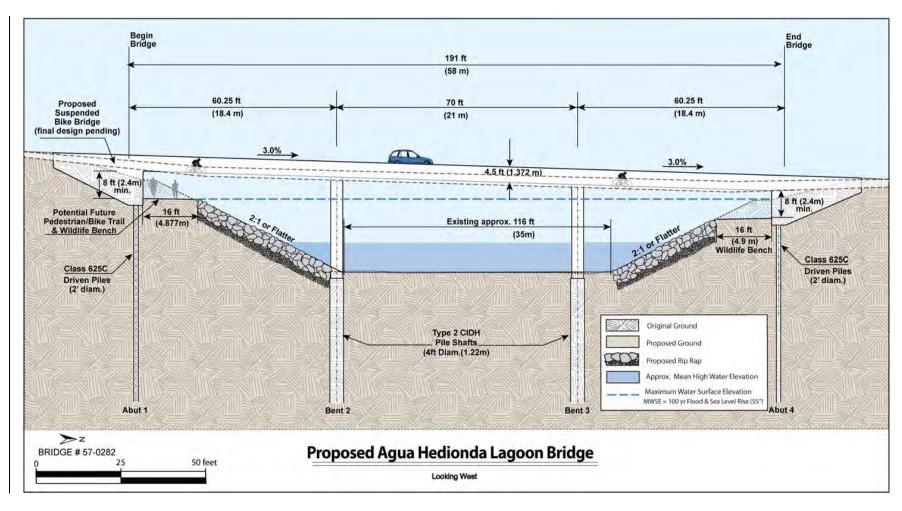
Agua Hedionda Lagoon: Cross-sections for the Existing I-5 Bridge and Proposed 8+4 Buffer
